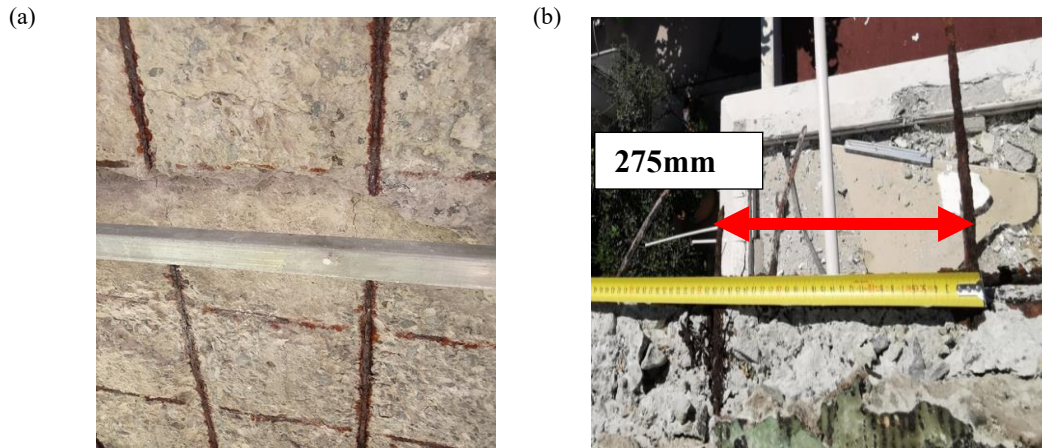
(a) Corrosion of reinforcement (Durable Structural Consulting Engineering); (b) Non-compliance with the minimum reinforcement spacing (Durable Structural Consulting Engineering).
